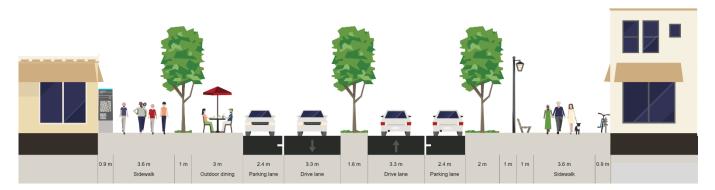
Downtown Street with expanded sidewalks, patios, and streetscaping
